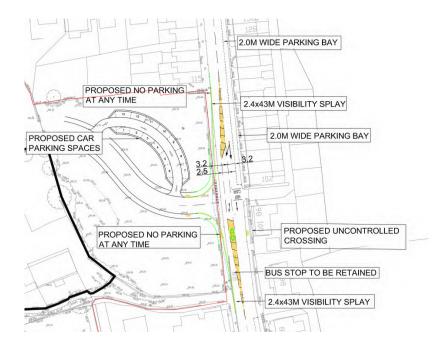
Extract from Applicant's Corridor Improvement Strategy (April 2024 Randall Thorp Report)
